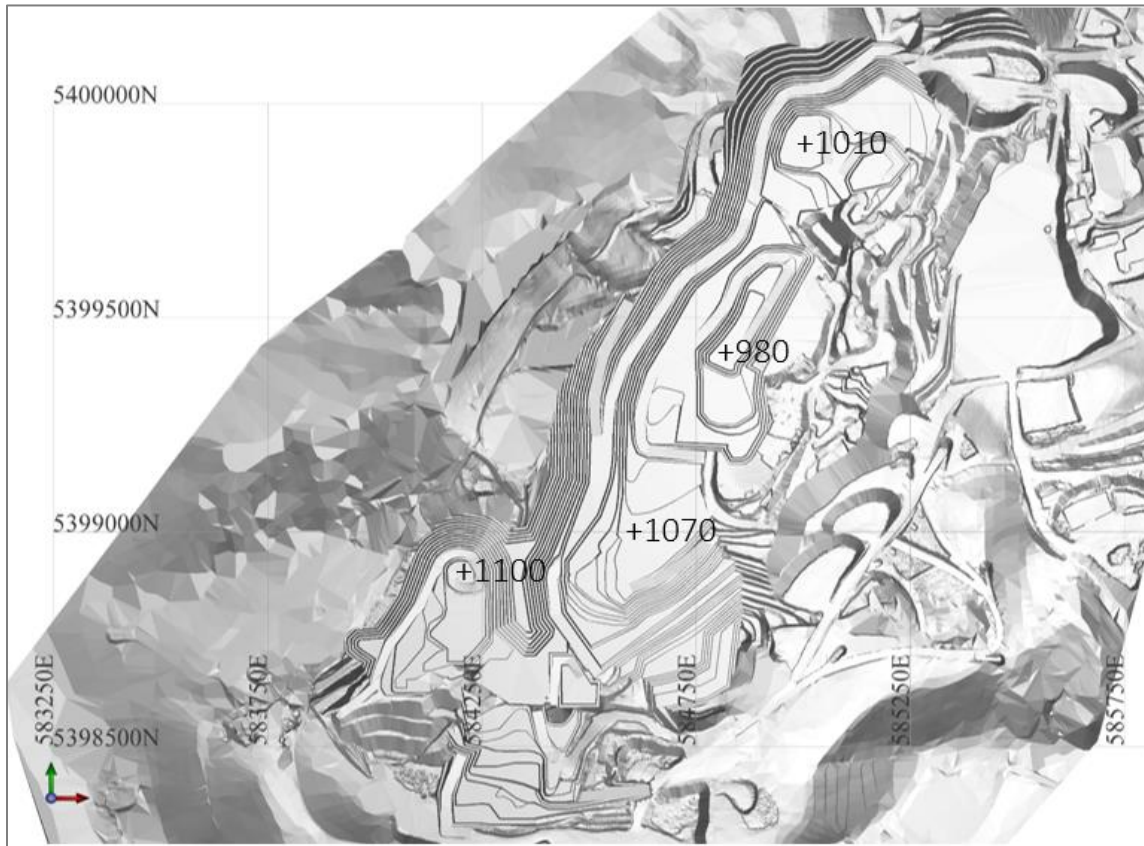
Boroo Ultimate Pit Design, Plan View
